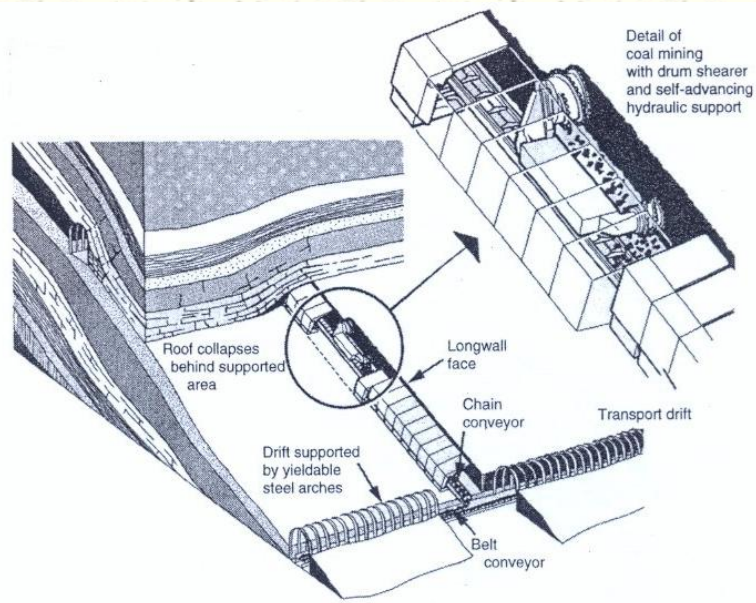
Longwall mining in soft rock (coal seam)
